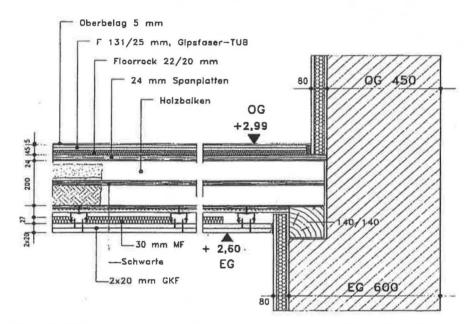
, 14: Renovation of the former school at Obernbreit - sectional view of the ceiling above the ground floor at the south / east facade
